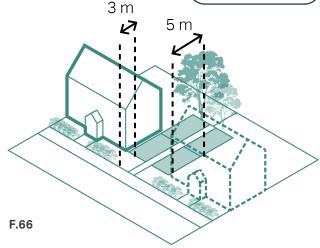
Illustrative diagram showing an indicative layout of on-plot side parking
